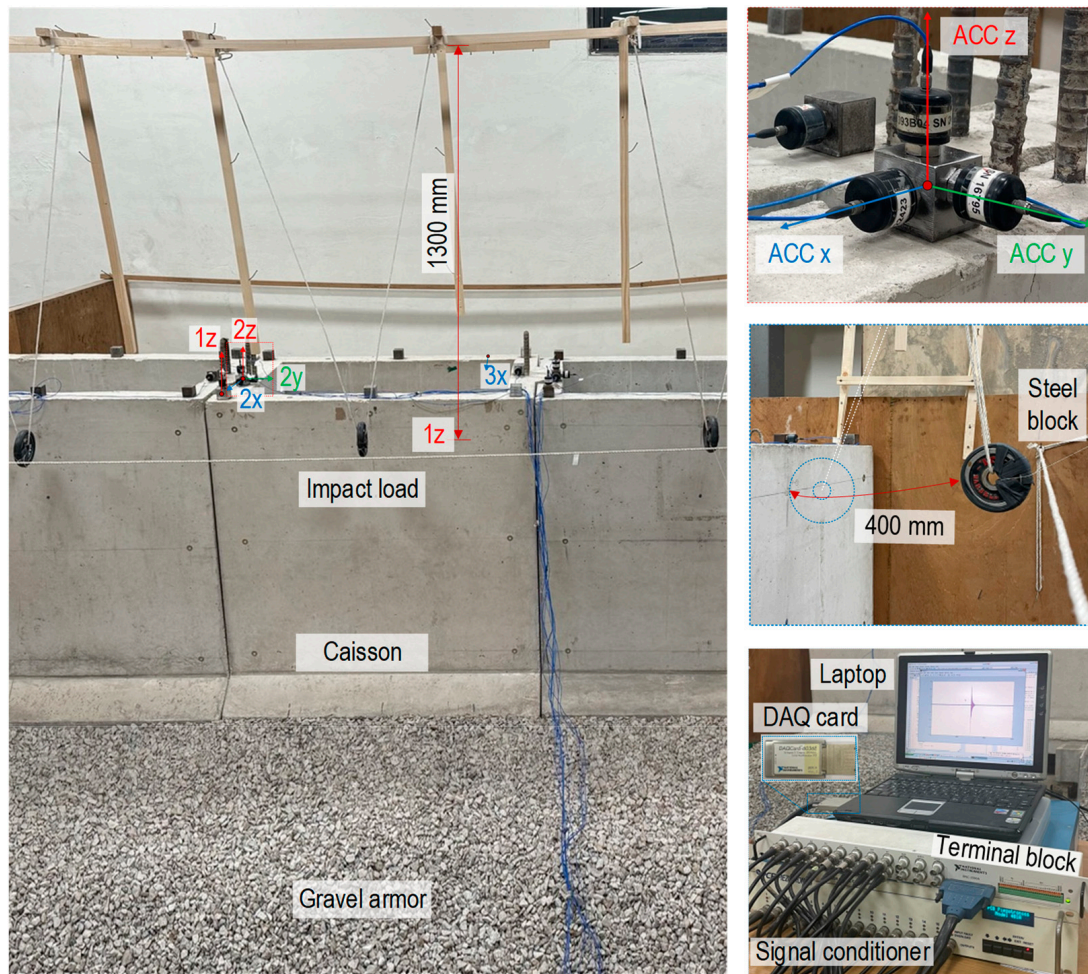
Experimental setup of the lab-scale caisson-foundation system.
